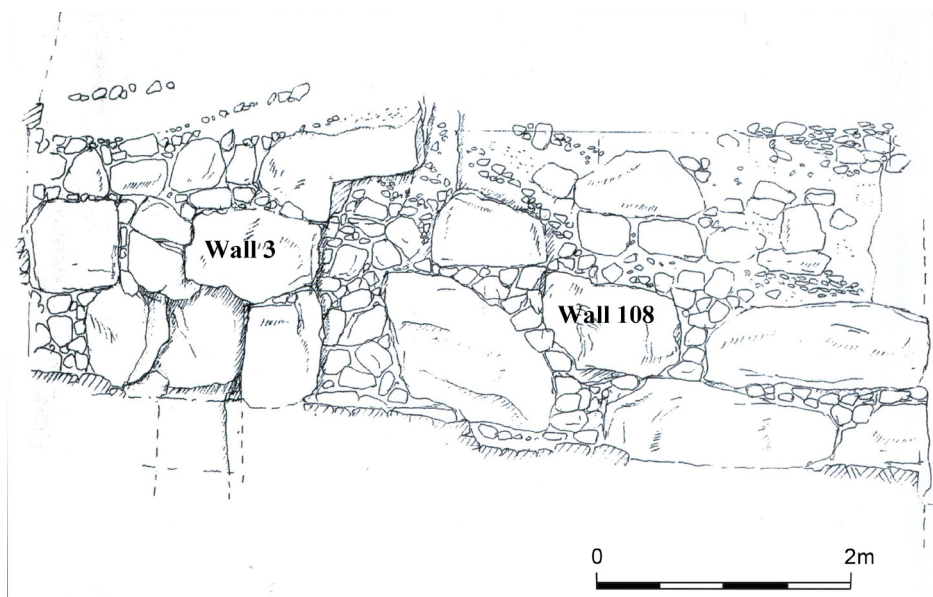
The connecting point between Walls 3 and 108 as documented by Reich and Shukron (2010, looking west). According to their understanding Wall 3 abutted Wall 108. We suggest that the two walls were built together.
